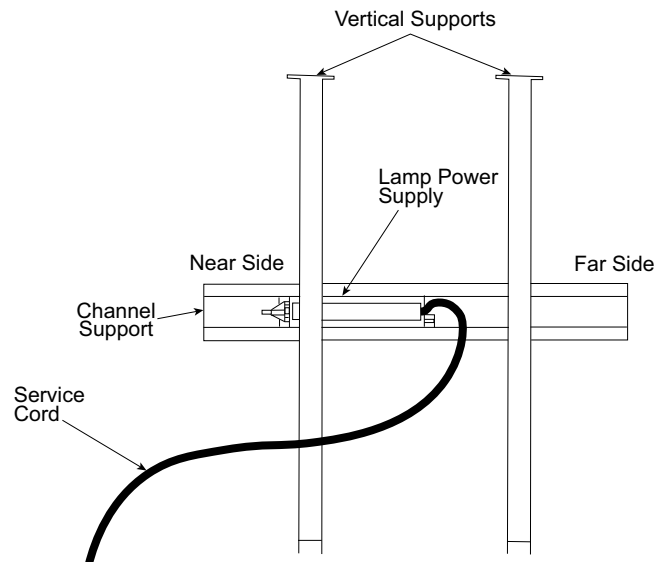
Typical UV-C Lamp and Fixture Kit in a 39M Coil Section
